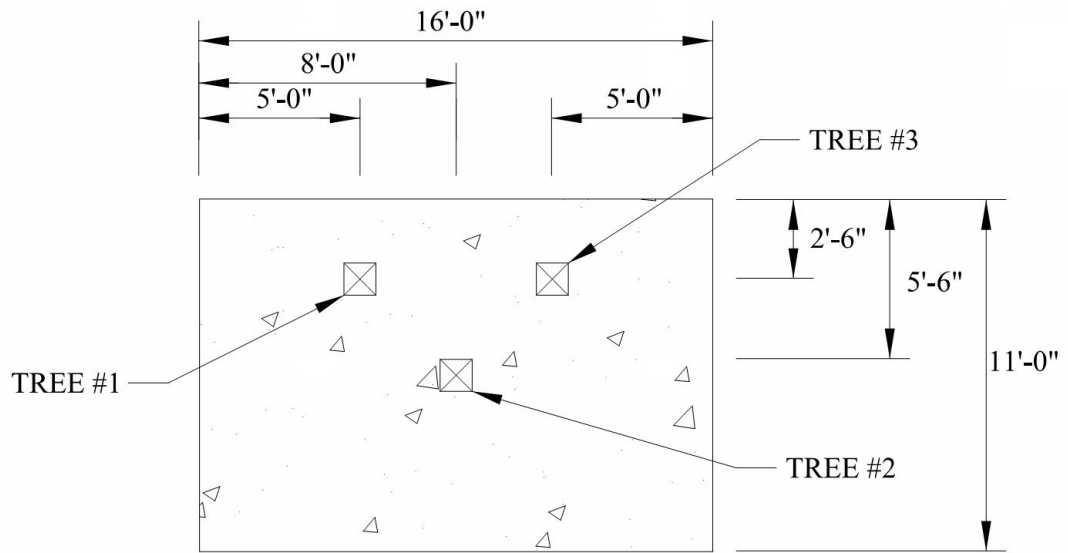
VWSG Tree Placement in Concrete Panel
